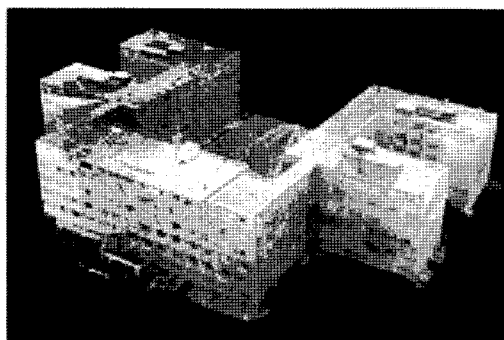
3D view of point cloud of first Engineering Building at Yonsei University
